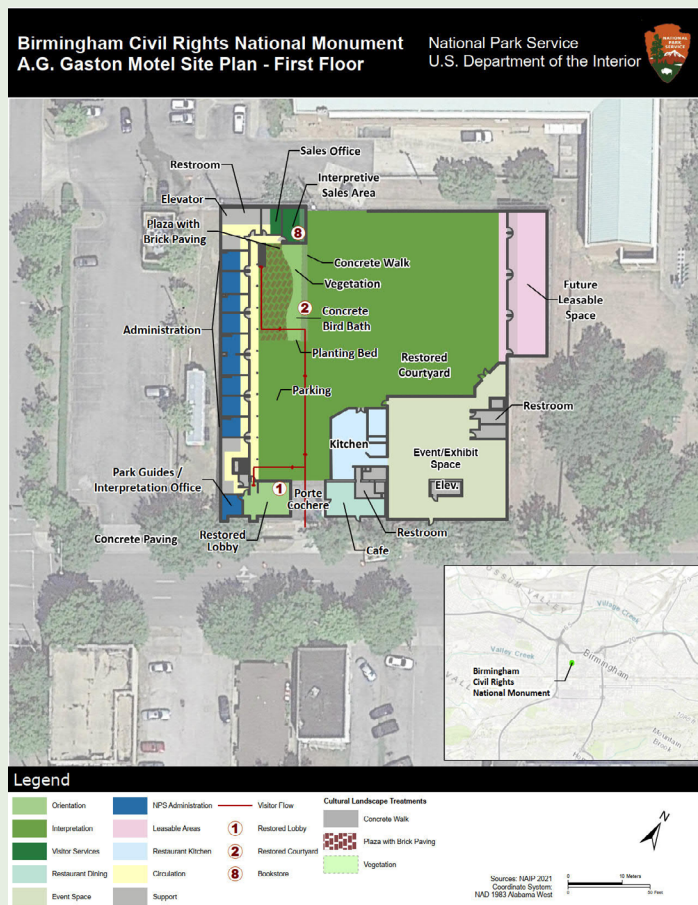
Proposed Site Plan for First Floor of A.G. Gaston Motel
